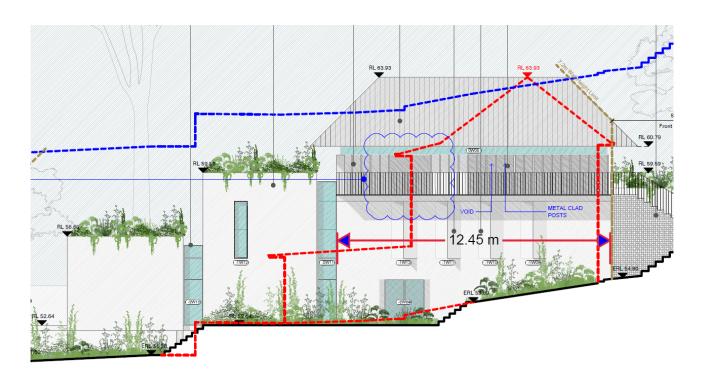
North elevation with maximum unarticulated wall length shown by red arrow (Source: Common Office, overlay by Council).
